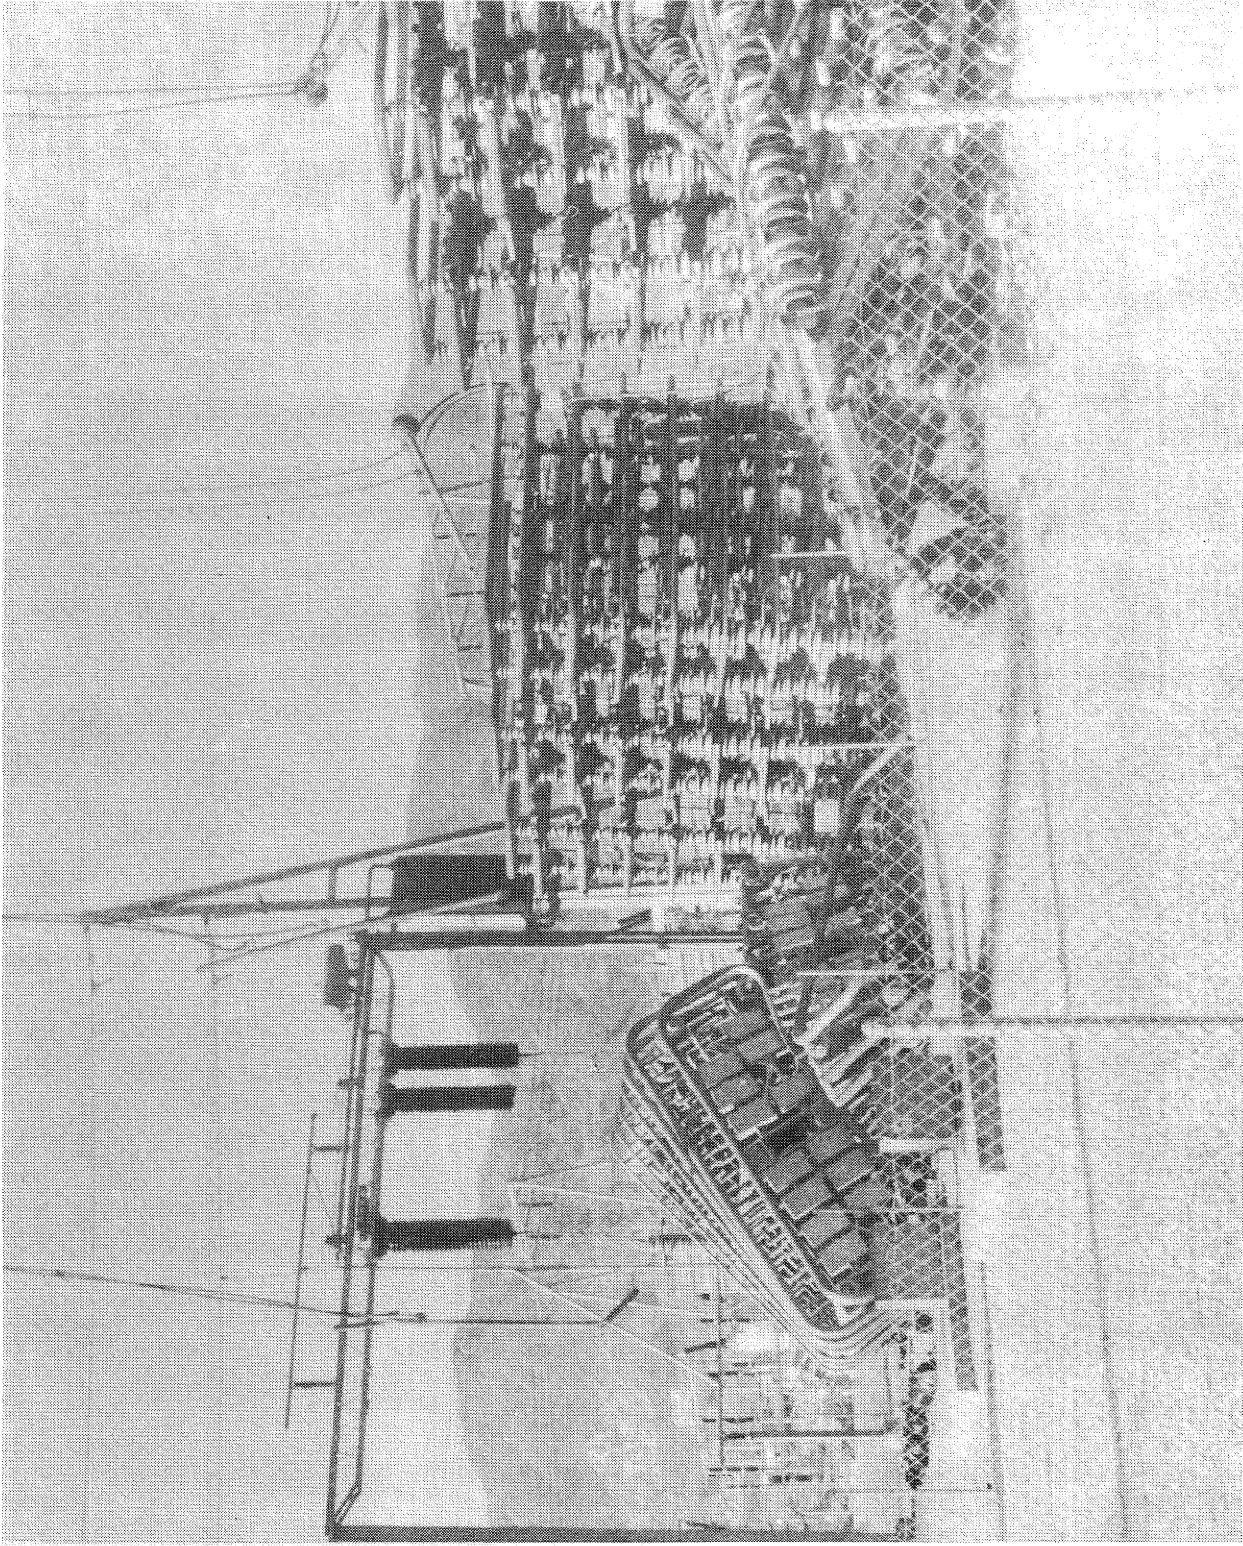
Collapsed outdoor equipment at Sylmar Converter Station.
